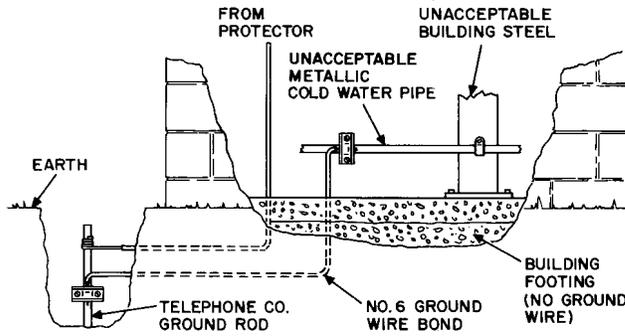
Acceptable Water System or Building Ground Not Available—Power Service Not Grounded
